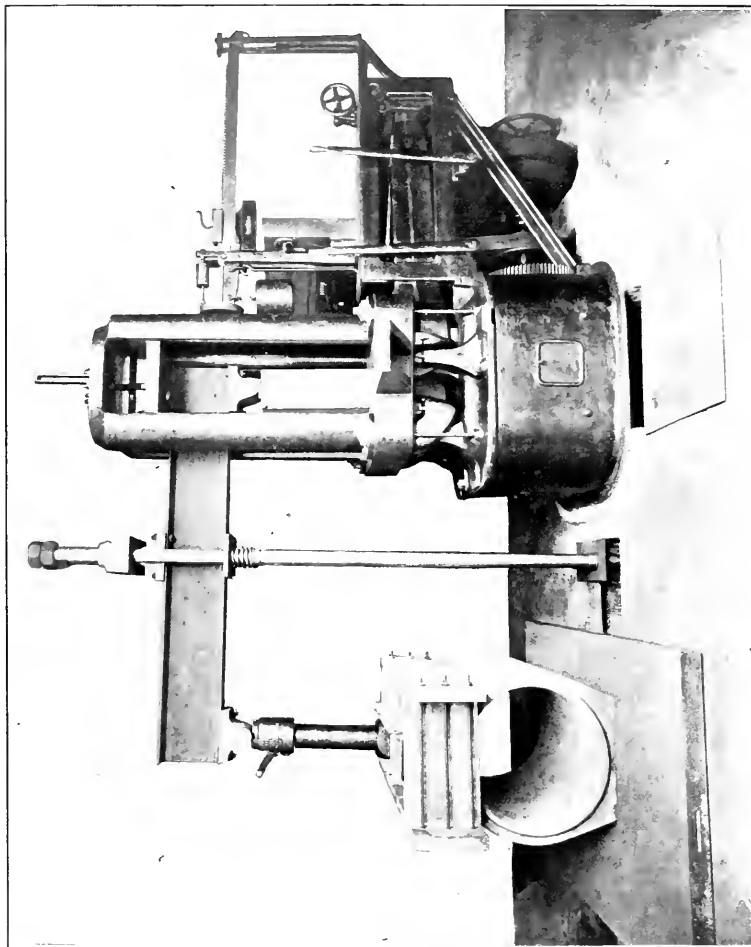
PLATE XLVIII. TESTING MACHINE BREAKING CONCRETE PIPES.
